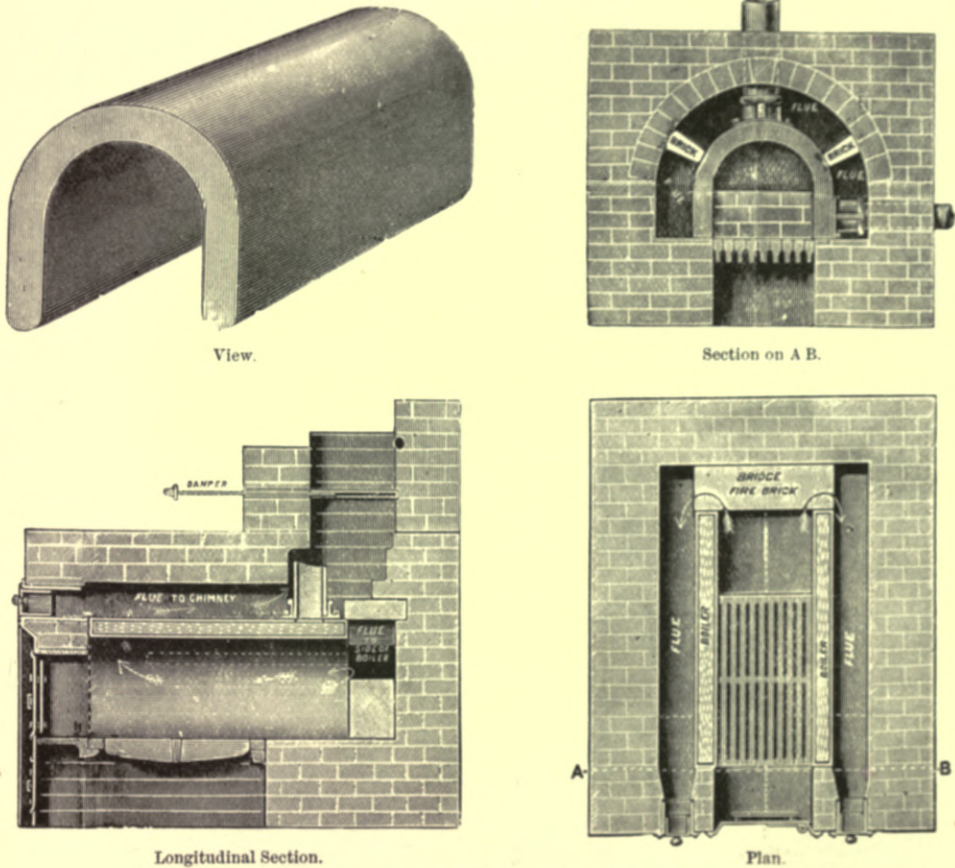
Plan, View, and Sections of Simple Saddle Boiler.
